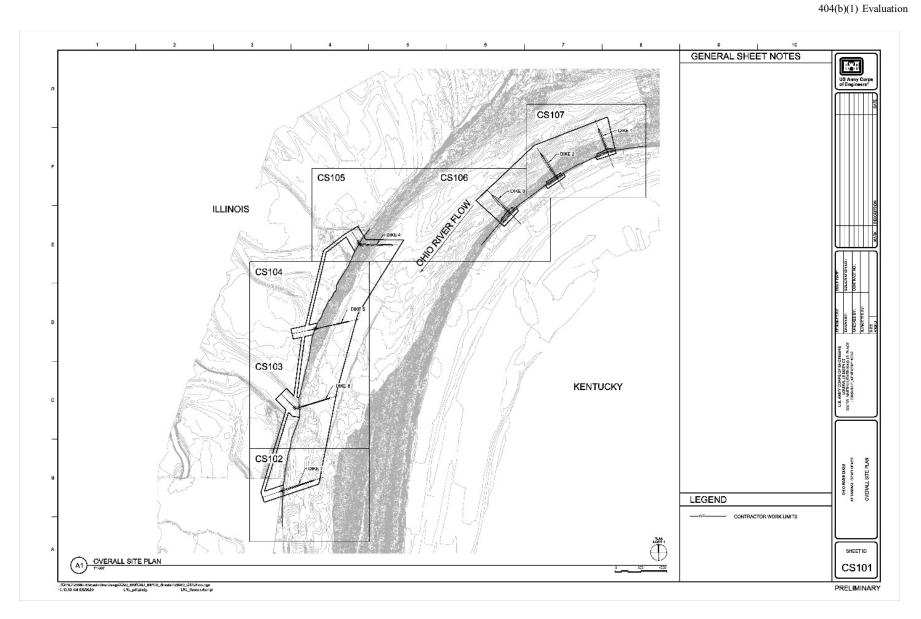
Overall Site Plan for the proposed Wabash Dikes Project.
